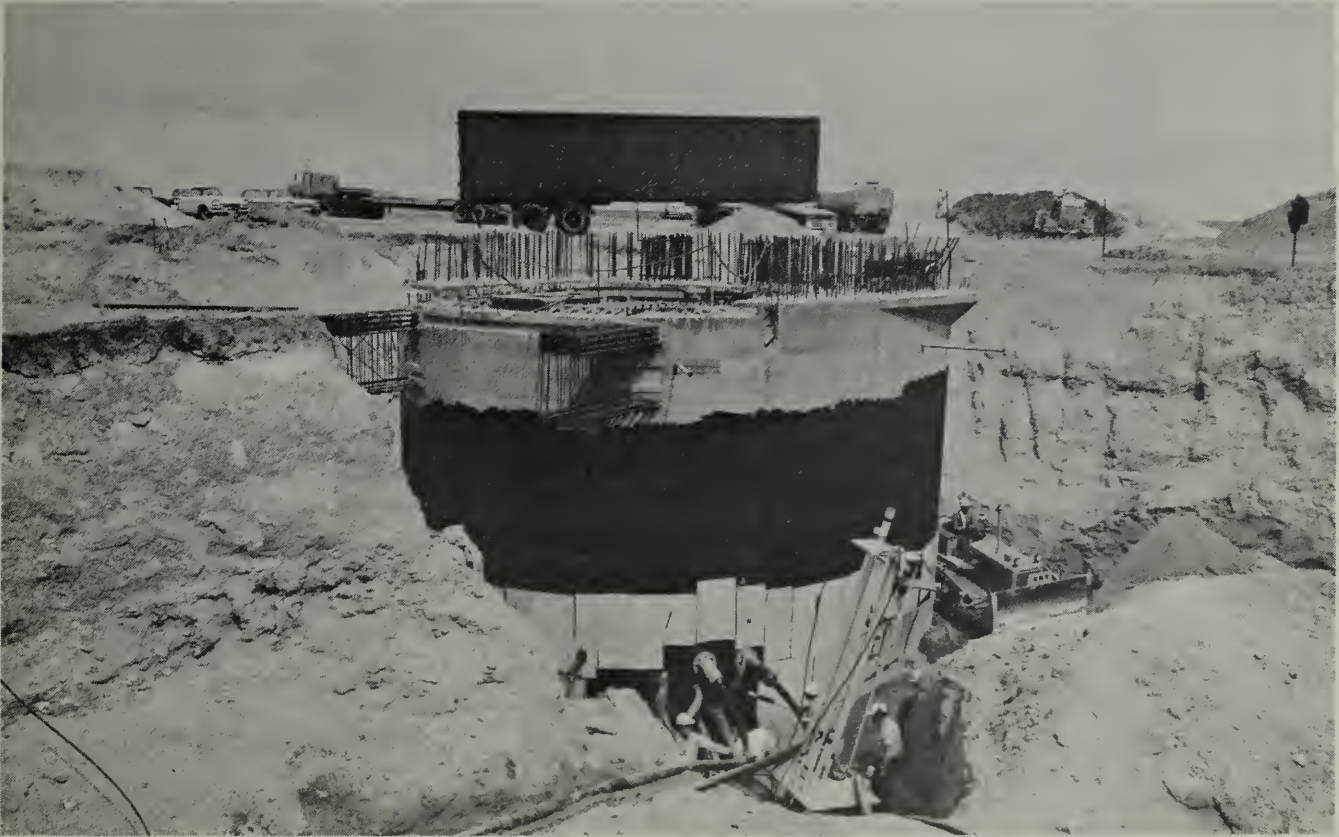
HOT-APPLIED BITUMINOUS MEMBRANE; WATERPROOFING OF THE FIVE-PLY ASPHALT TYPE, PLACED OVER ASPHALT PRIMED CONCRETE AND PROTECTED WITH INSULATING FIBERBOARD. THE FIBERBOARD WAS PRESSED INTO THE FINAL MOPPING WHILE THE ASPHALT WAS STILL HOT.
